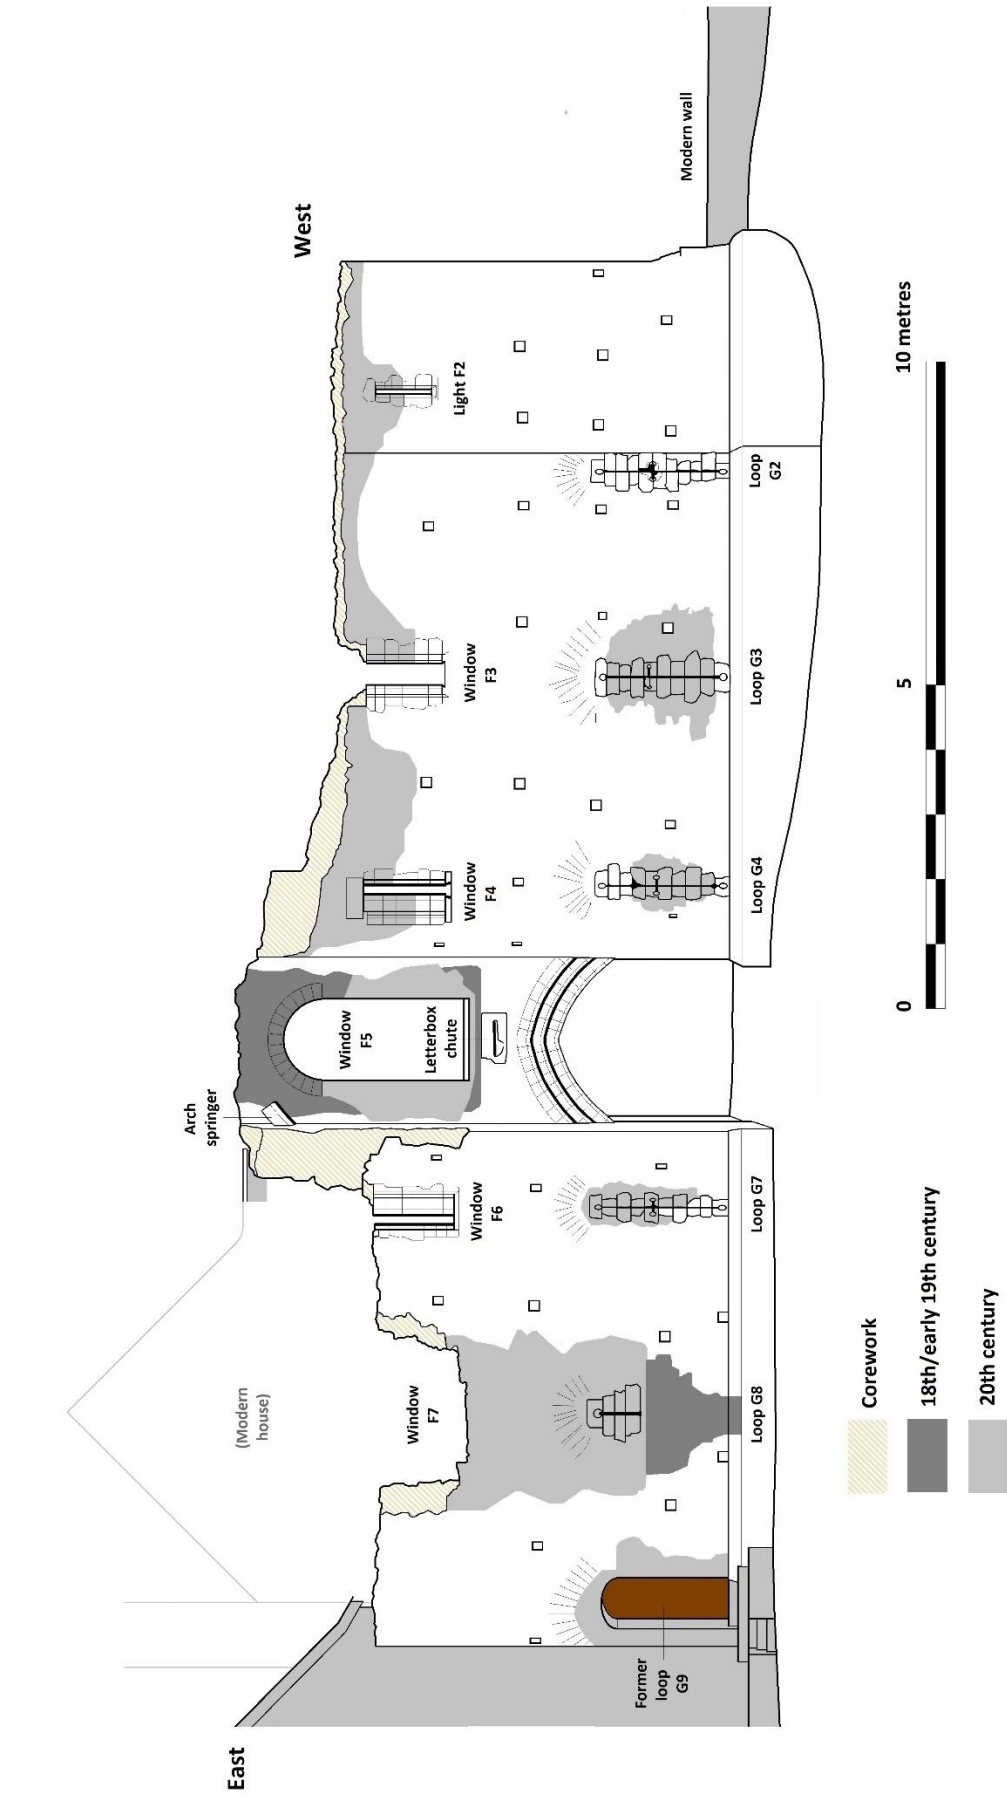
Leybourne Castle gatehouse – south-facing elevation
